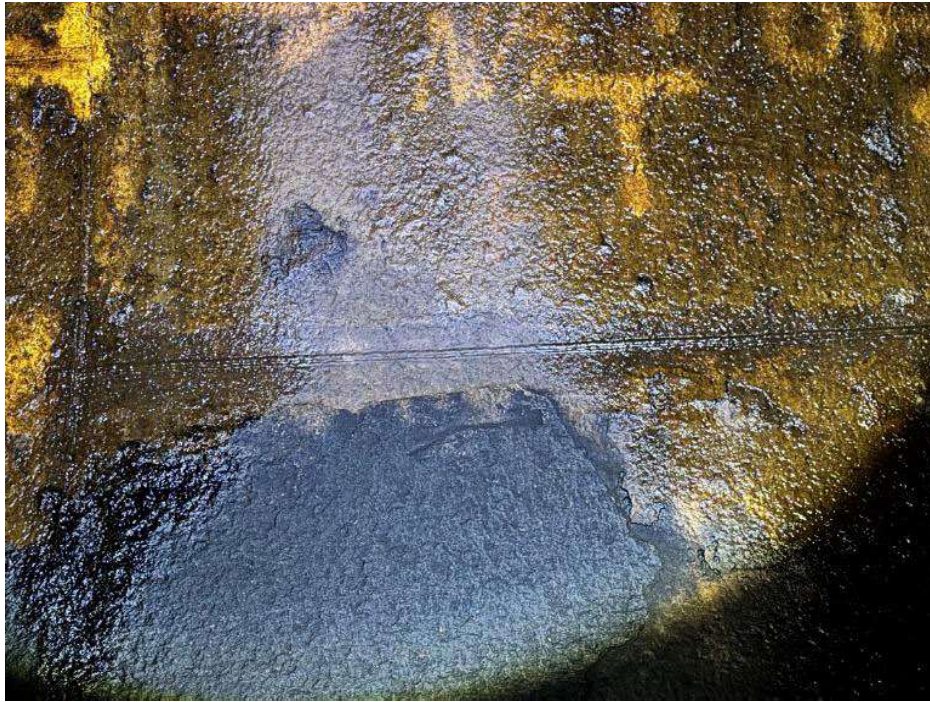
Close-up of Weld 7N prior to being cleaned and tested
